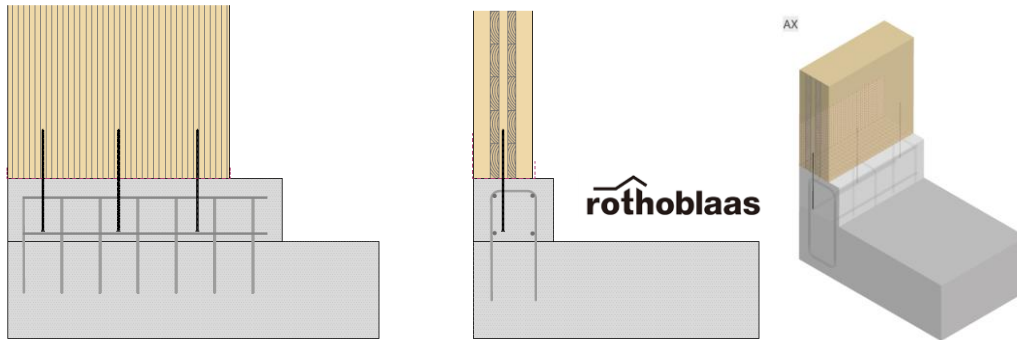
CLT wall to basement connection (copyright Rothoblaas)
